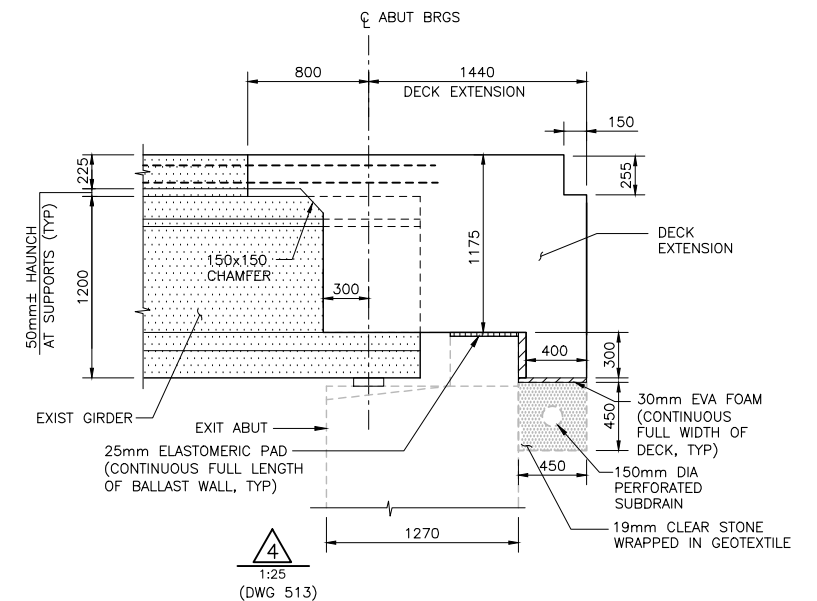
DETAIL B NOTE: SB SW CORNER SHOWN, SB NW, NB SE & NE CORNERS SIMILAR.
